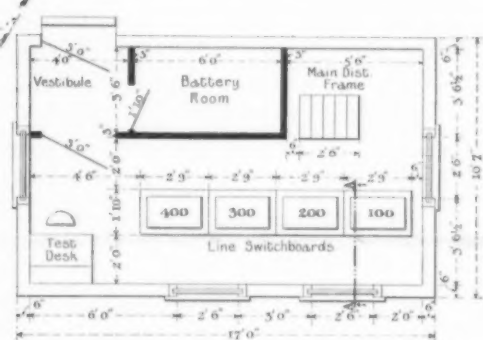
Floor Plan of Building to House District Station of 400 Lines.
